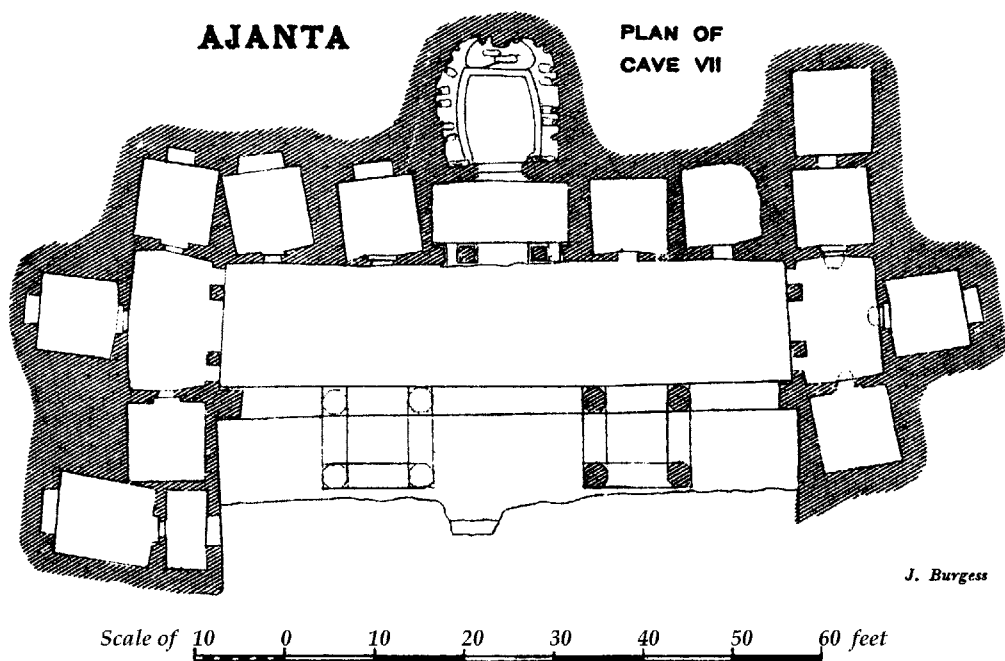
Ajanta Cave 7: plan (BCT 28)
